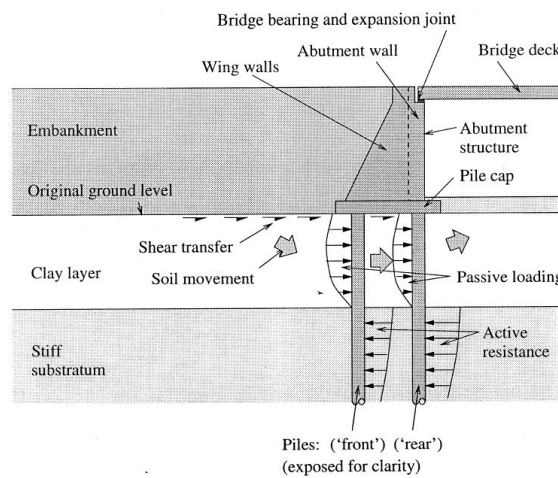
Schematic section through a full-height piled bridge abutment constructed on soft clay [4]
